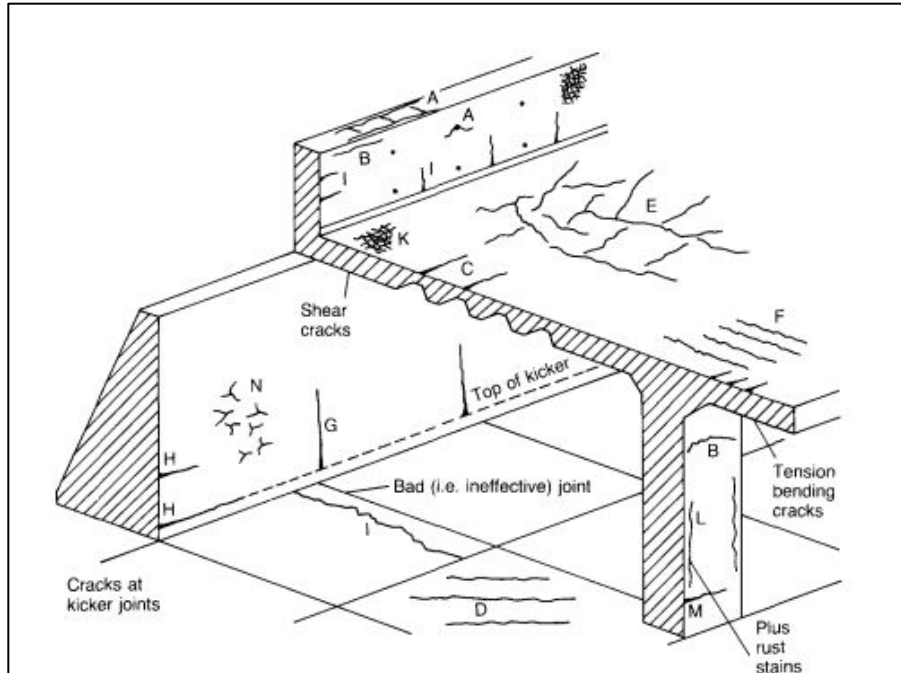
Examples of intrinsic crack patterns in hypothetical concrete – See Table 1 (op. cit. 11)
